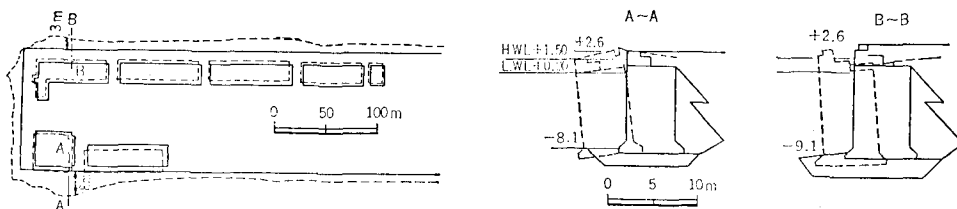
Cross Section of Gravity Type Walls in Kushiro Port
